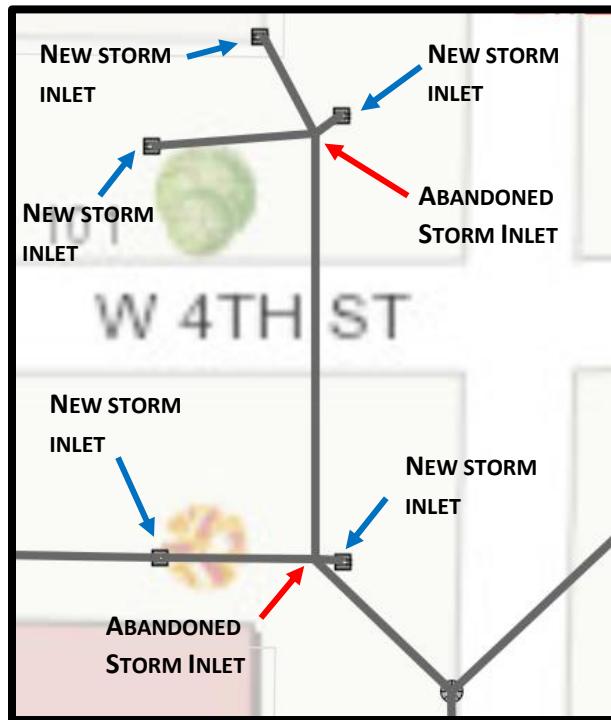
Non-Standard Stormwater Layout Along Fourth Street
